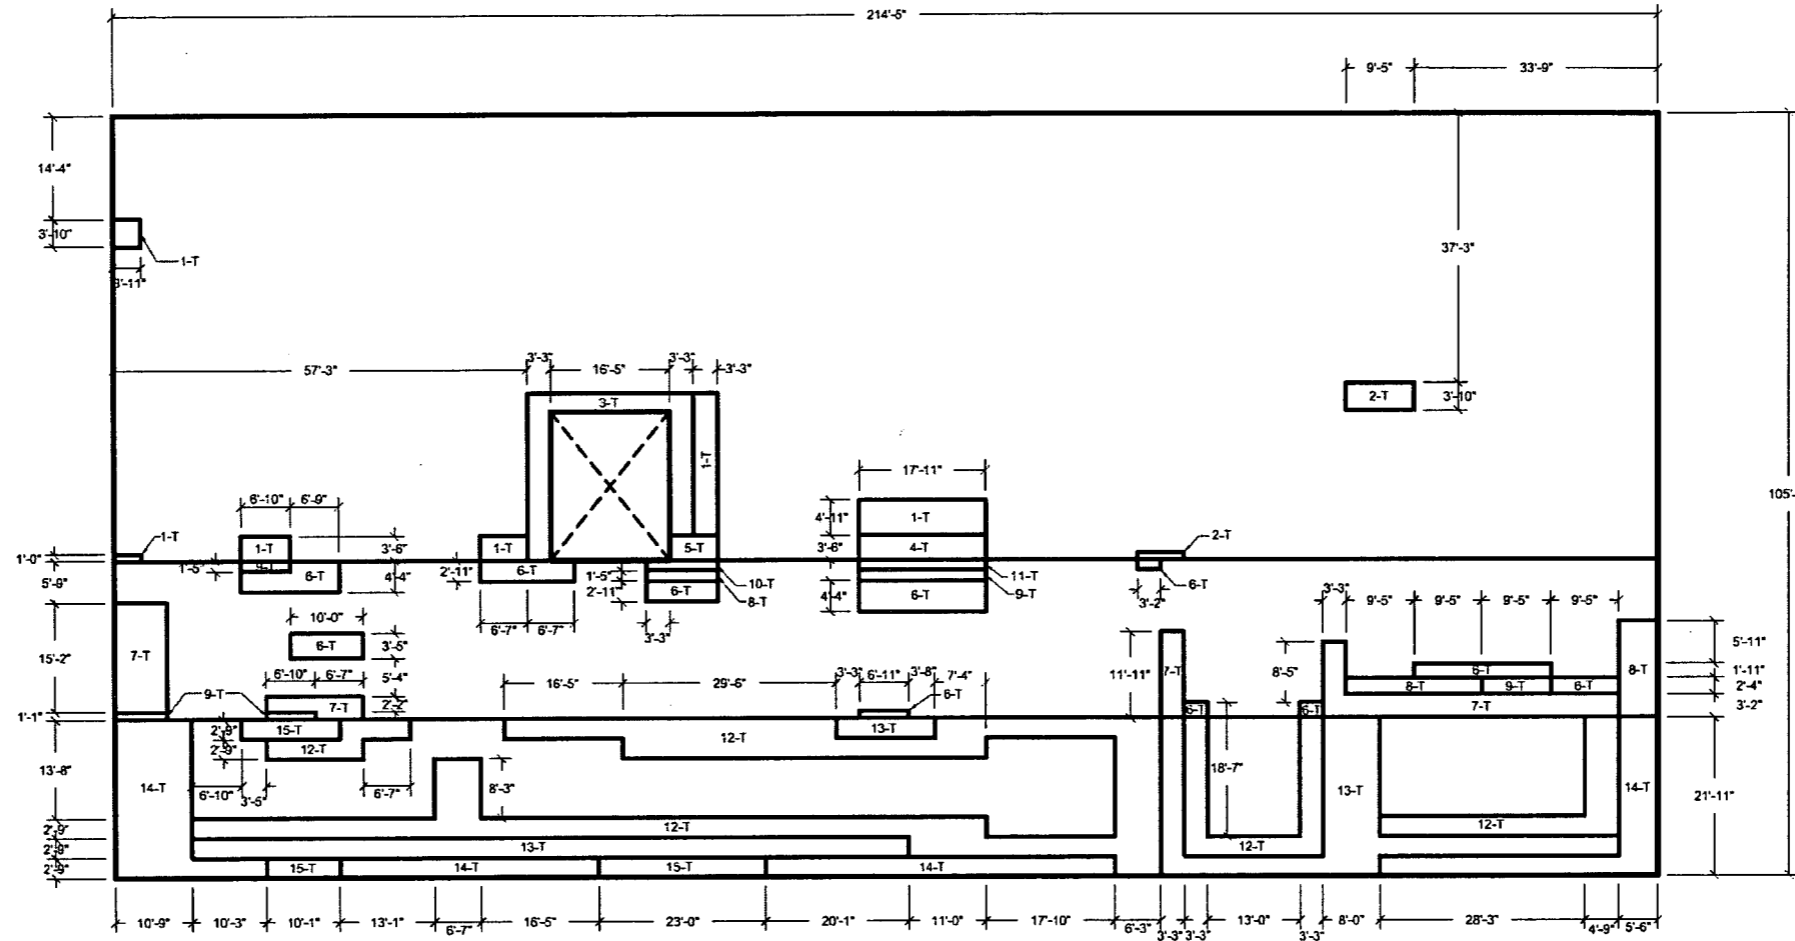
H.3-14; SOUTH WALL LOOKING NORTH
